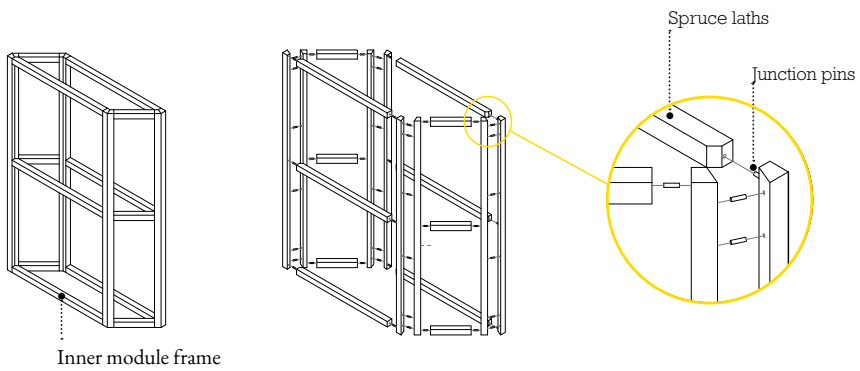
Construction detail - Inner frame held firmly in place by dowel pins and wood glue | Axonometry and axonometric exploded view.
